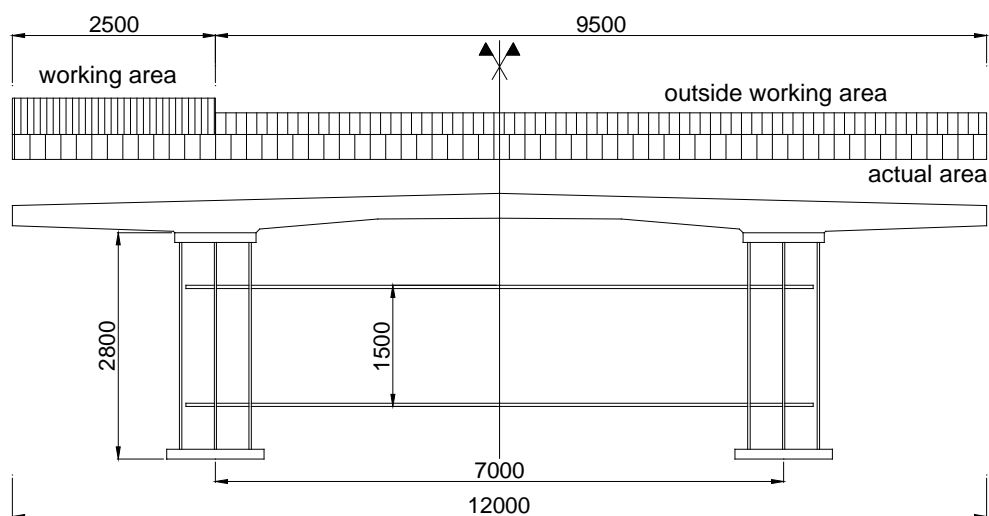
Load arrangement maximizing effects on the support cross section of the slab
